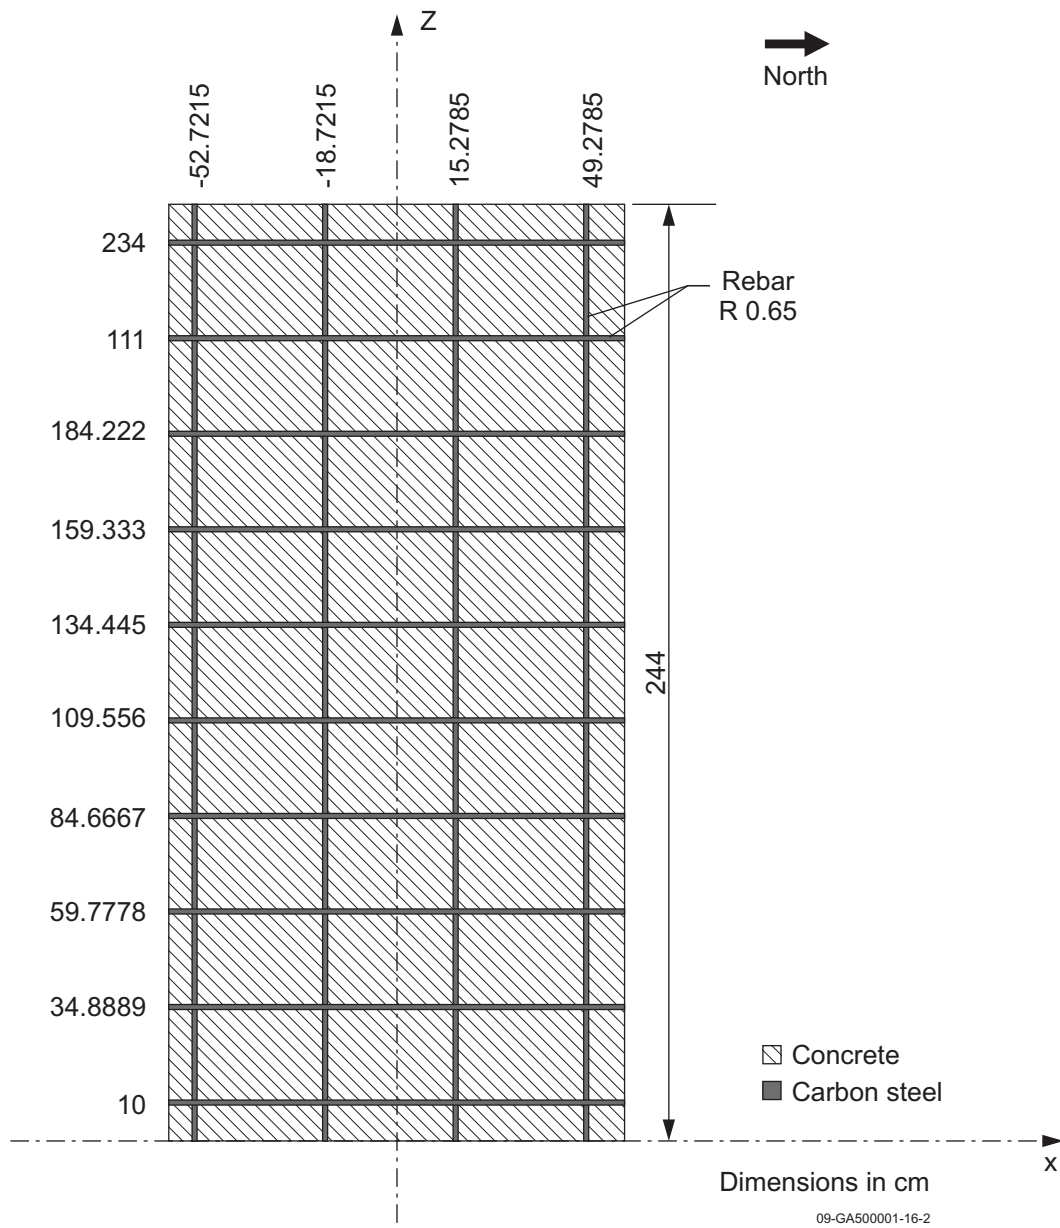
Detailed Model, East Side Enclosure Panel Showing Rebar Positions.
